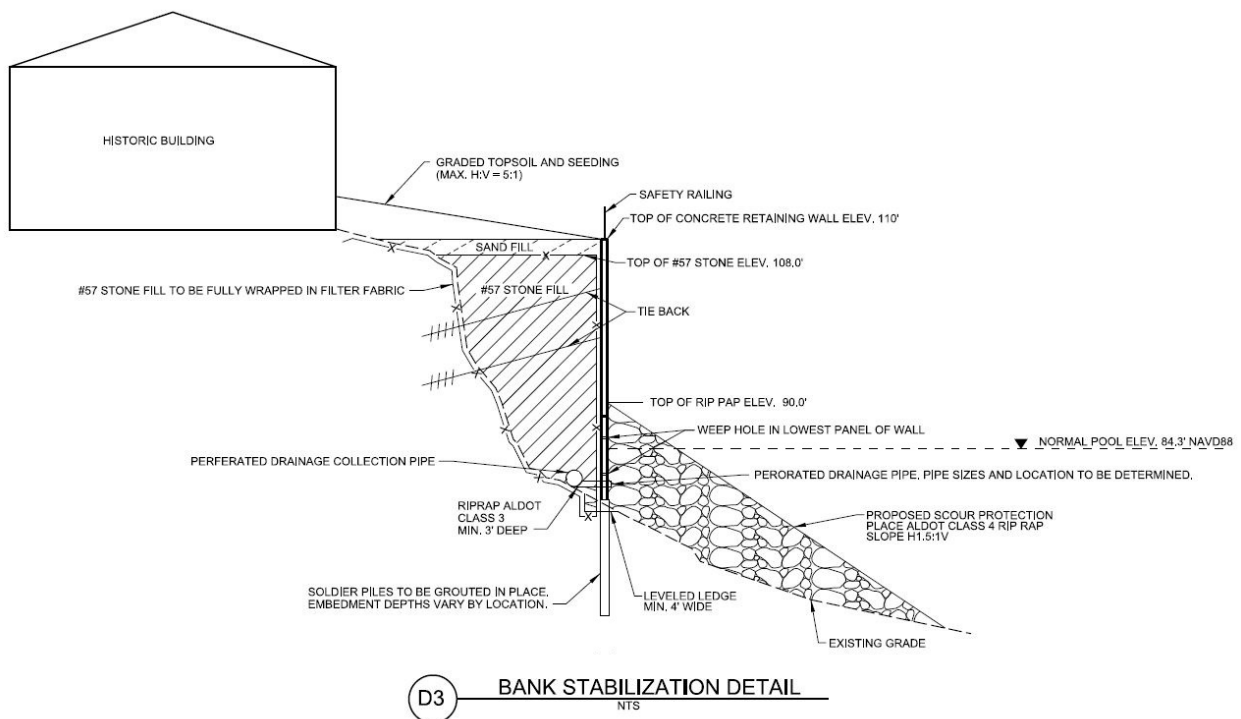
Conceptual Section View for Bank Stabilization in areas where secondary retaining wall is not required
